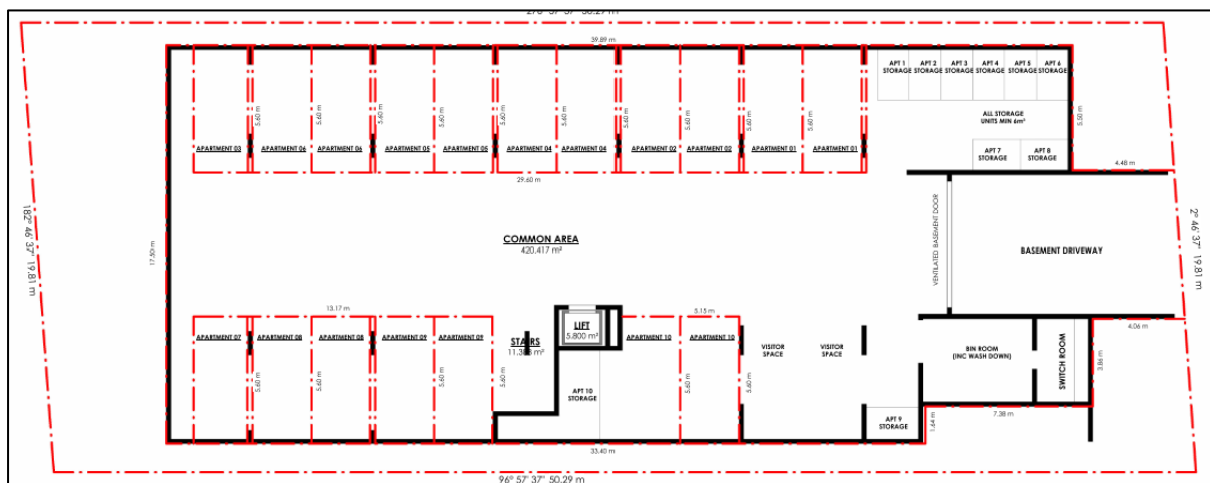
(Above) Proposed basement level plan of subdivision. Source: Application documents.
